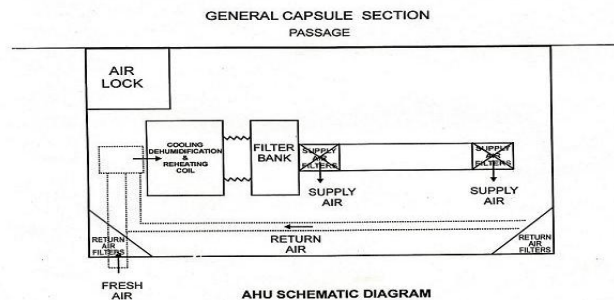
Typical arrangement for clean rooms using duct able split air conditioning units [5]
